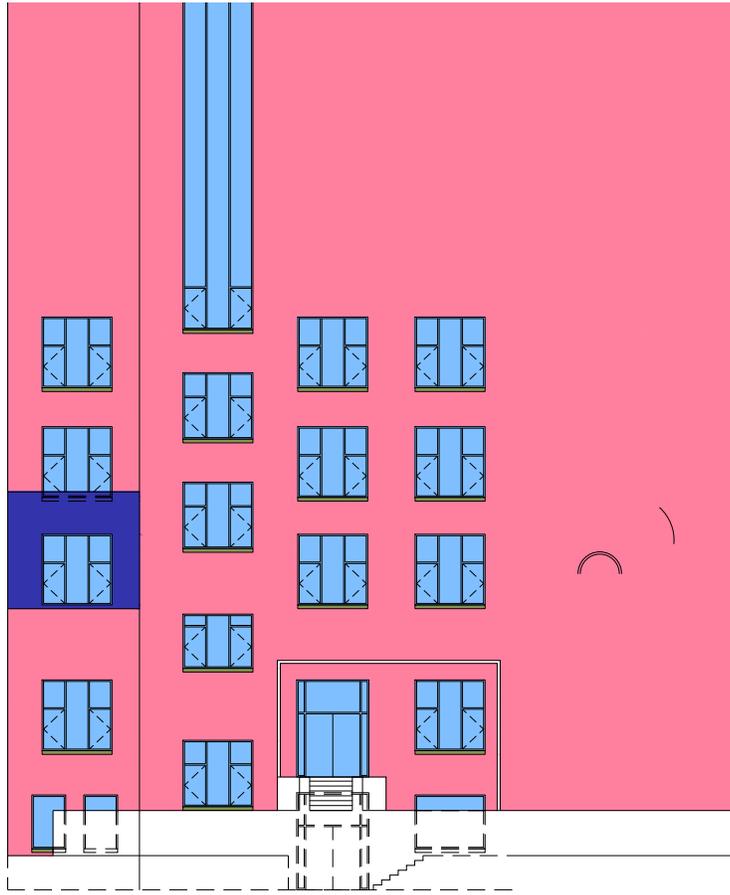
(5): North Courtyard: North-Facing Wall
